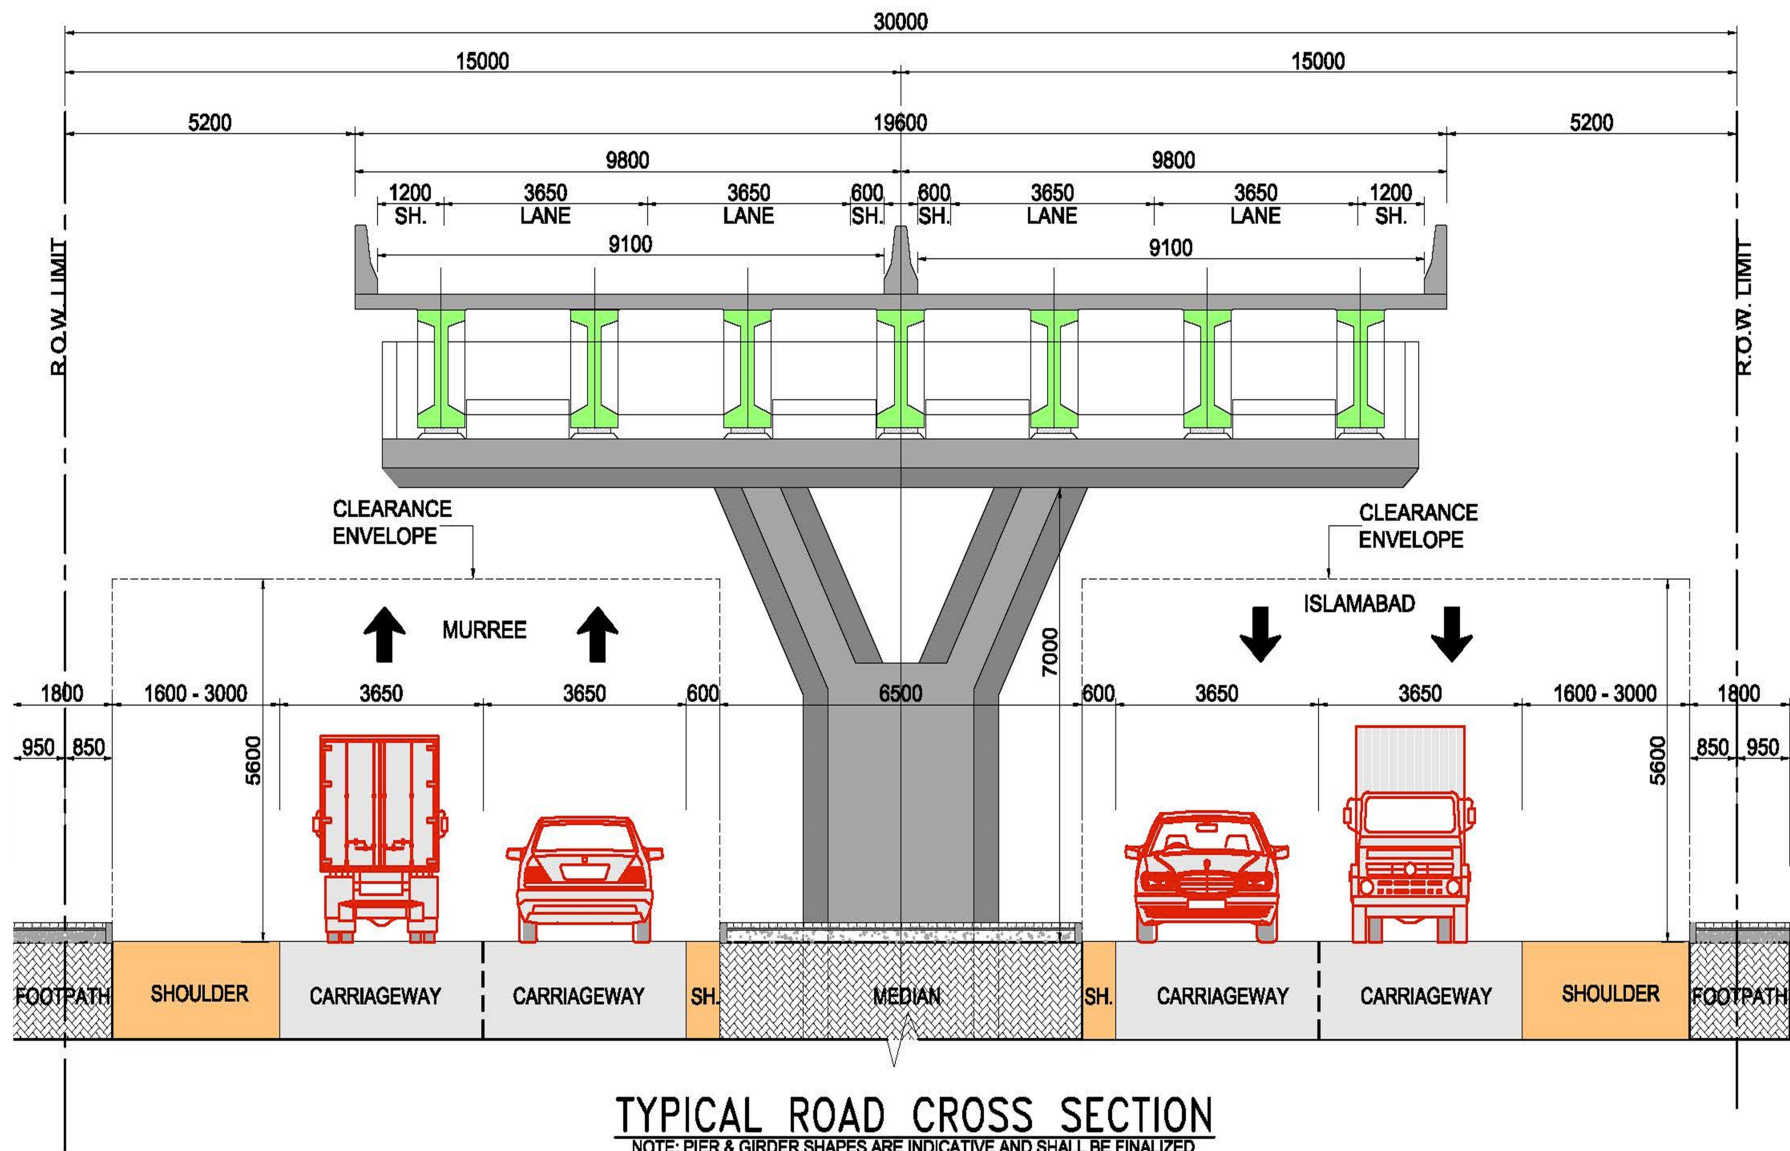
TYPICAL ROAD CROSS SECTION OF PROJECT
